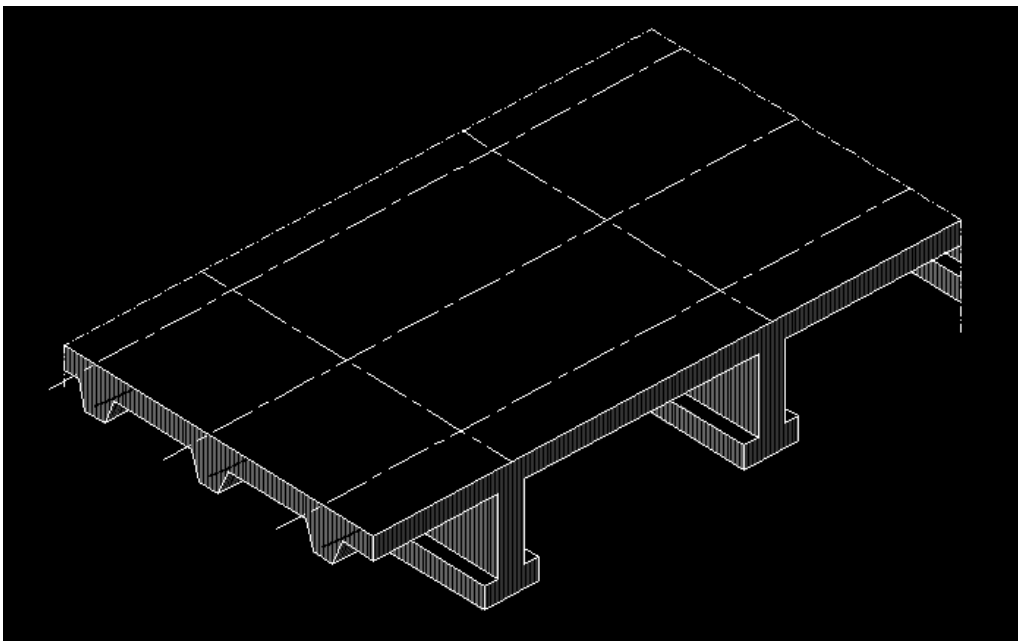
3D view of the ribs in the bridge deck plus the cross beams in transverse direction
